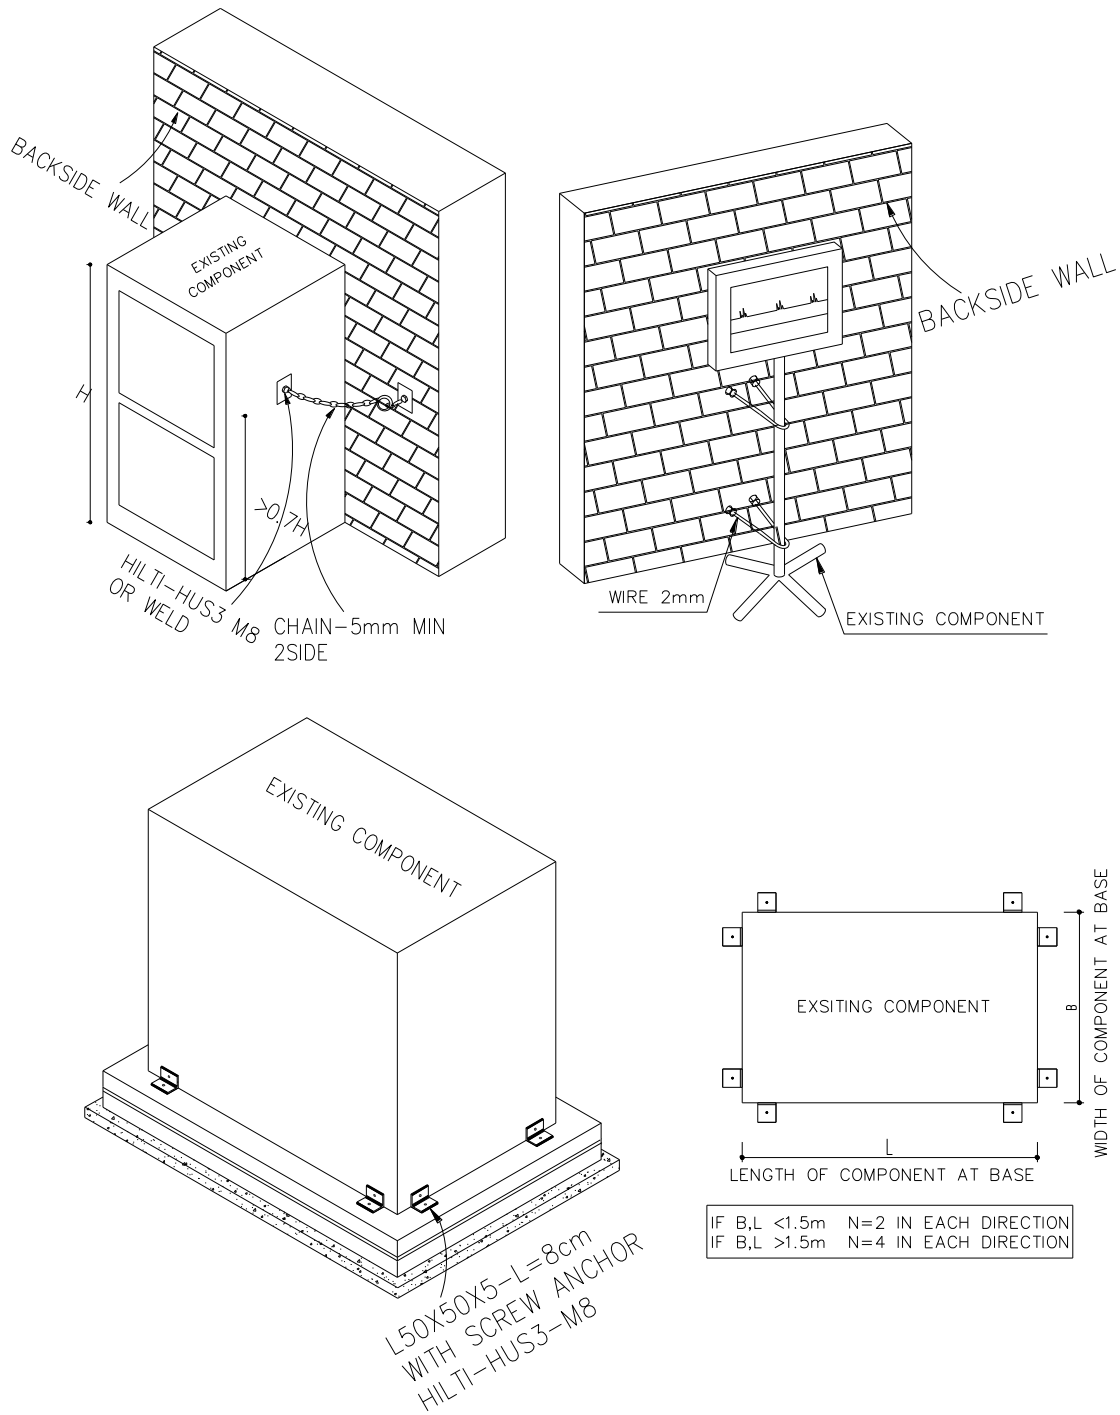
samples of provided retrofitting details drawing for non-structural elements
